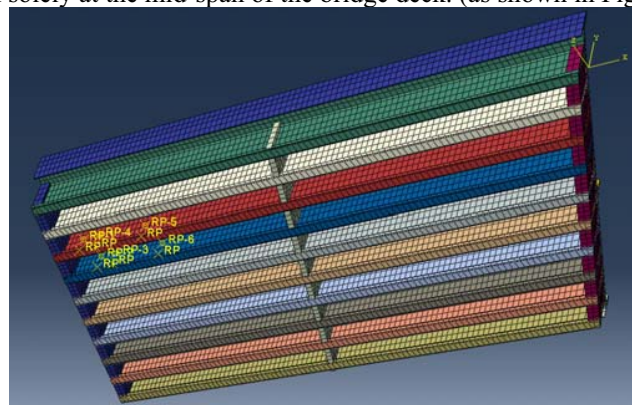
View of bridge deck underneath with arrangement of a single ID.
